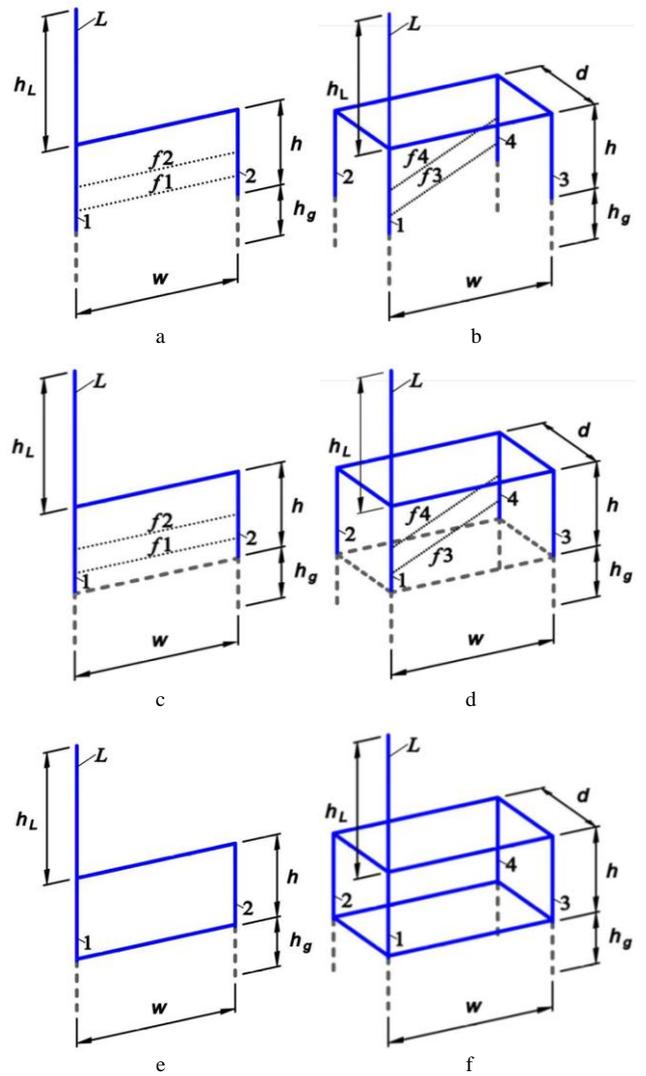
Frame structures, used in modeling: a, b – without ERC; c, d – with ERC buried in soil at a depth of 0.1 m; e, f – with ERC placed 0.1 m above the earth/water surface
